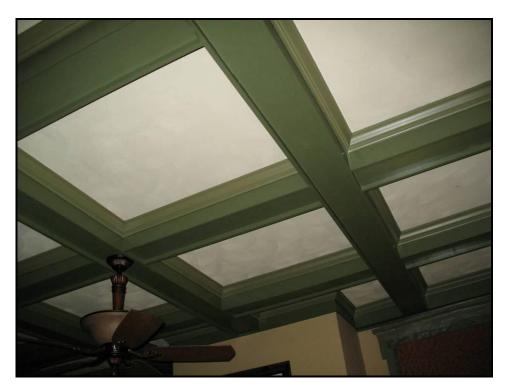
"Boxed Beams" added to Parlor Ceiling, View Looking North.
